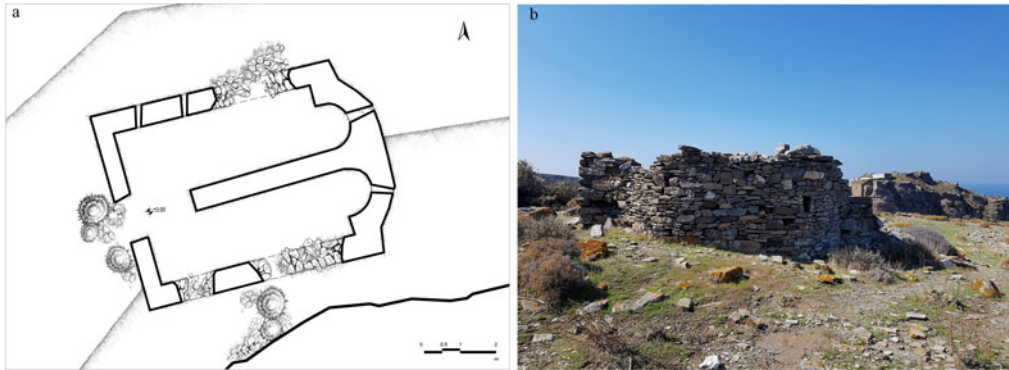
Ch 19 (a) floor plan, nave divided into two aisles by axially placed wall (b) east elevation, apses externally inscribed in a bigger polygonal apse.
